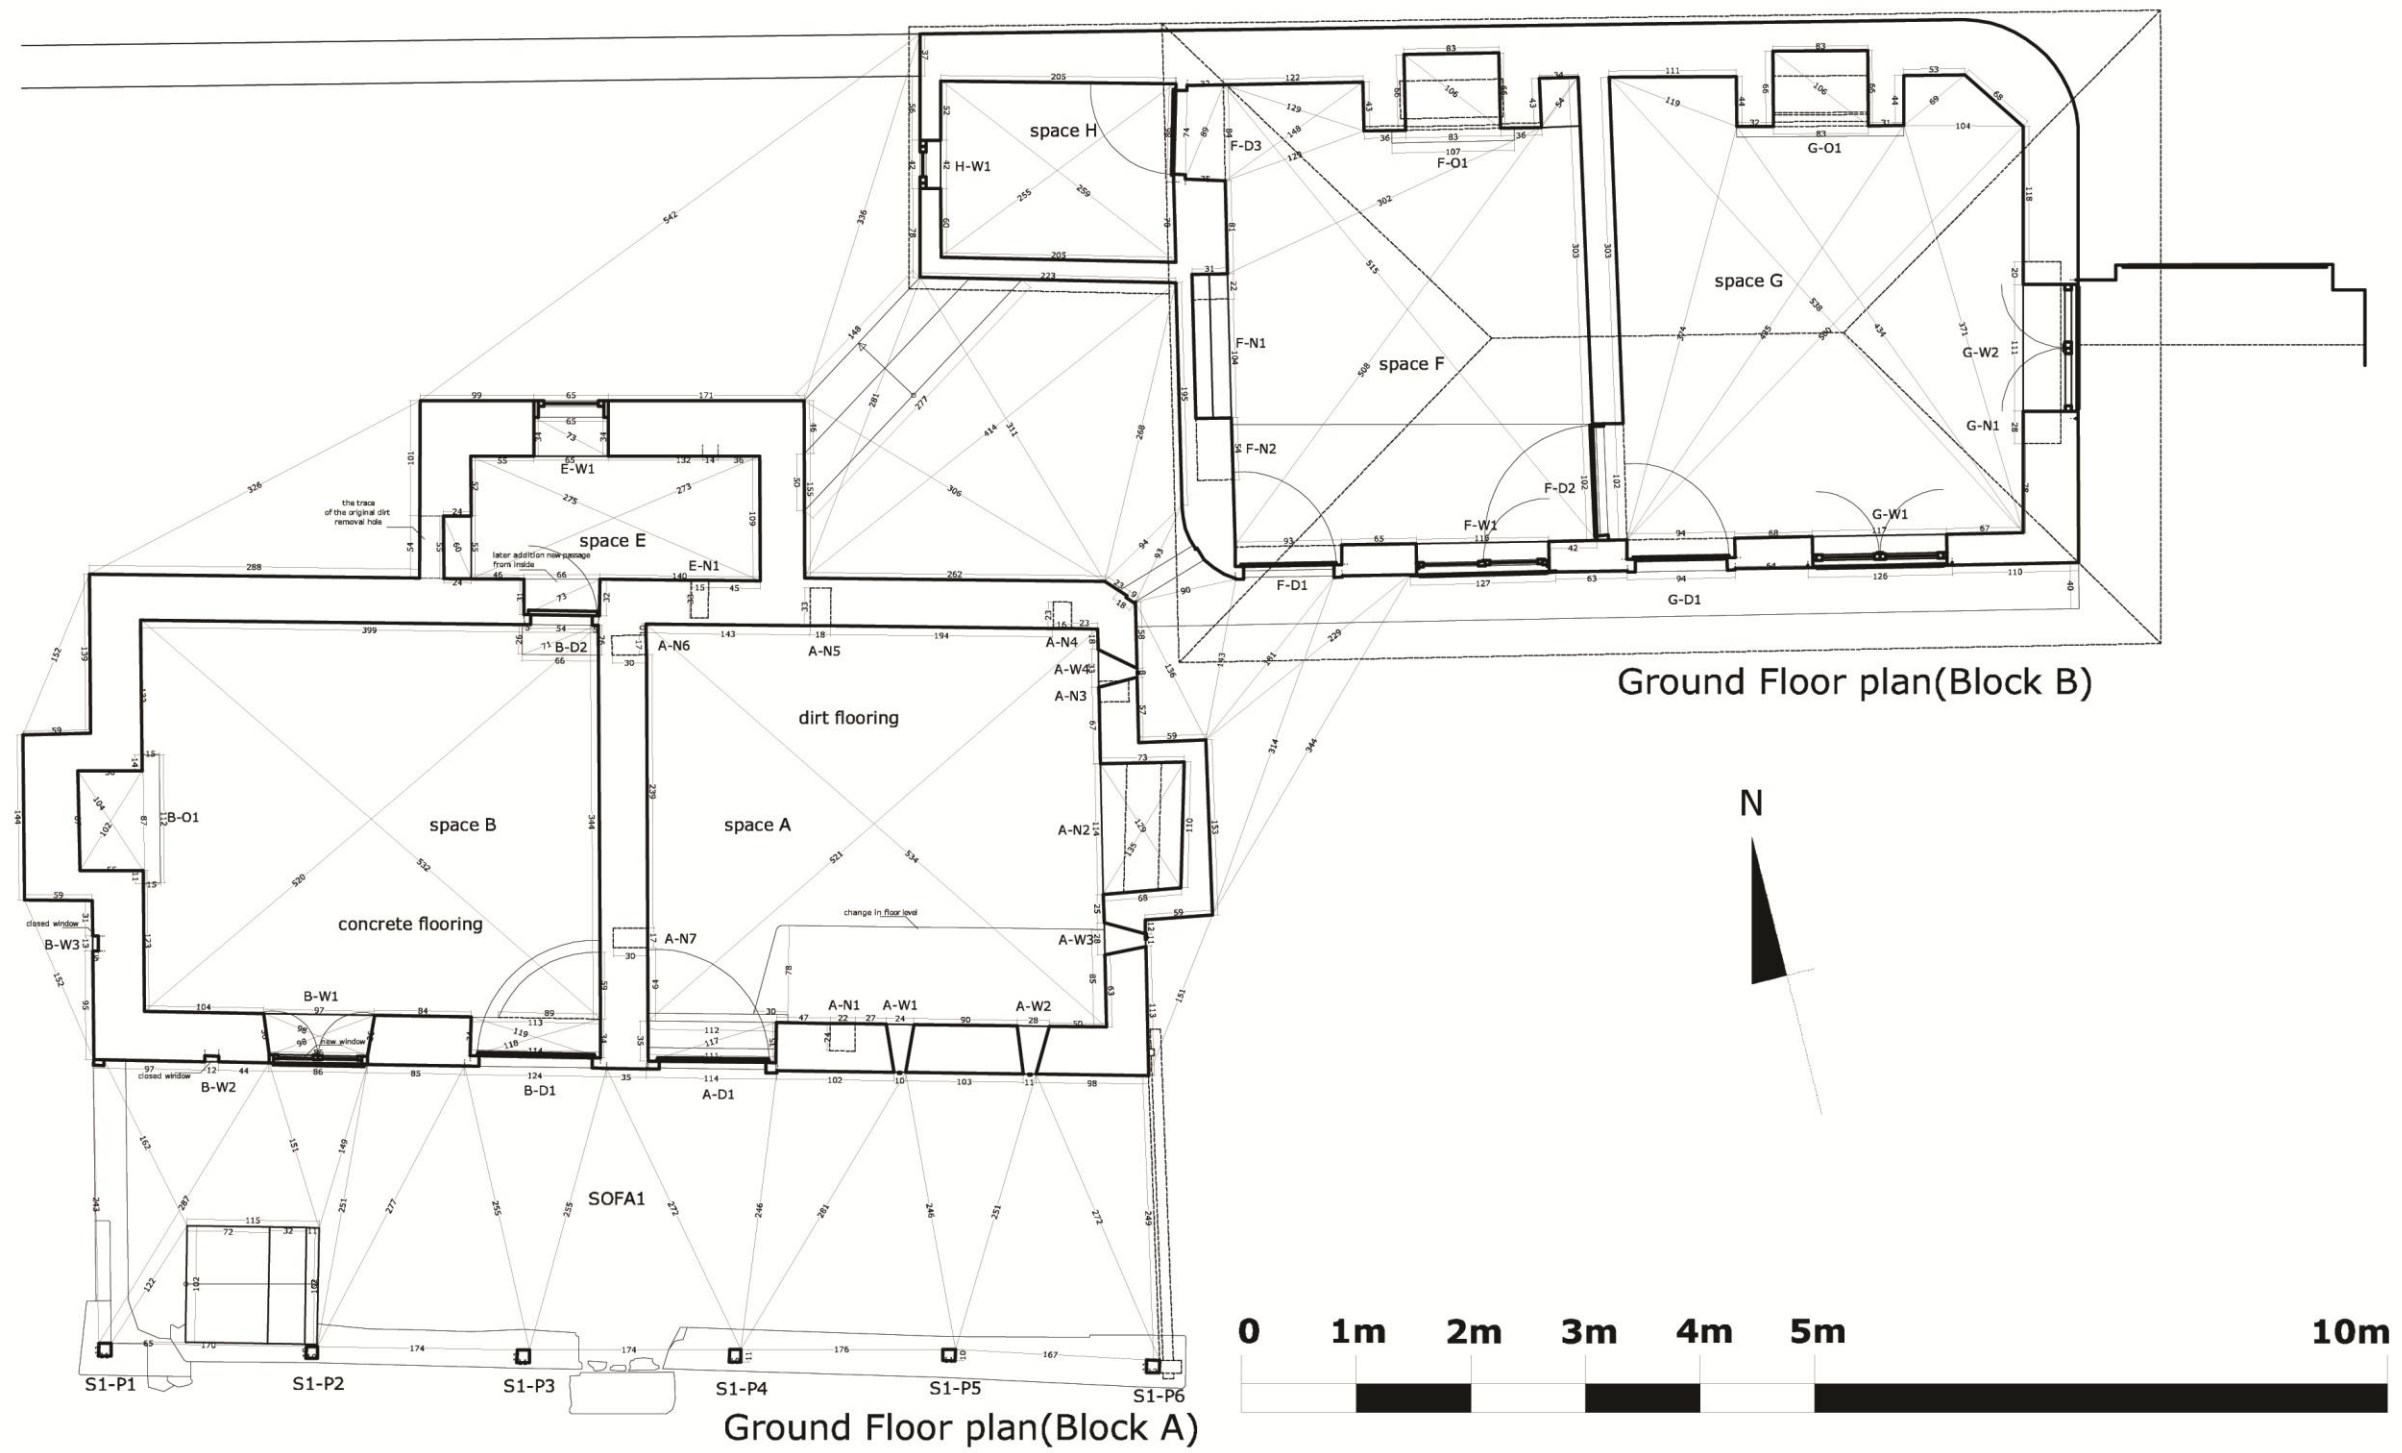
Ground floor plans of the buildings in the *yurt* of Köseoğlu Family
